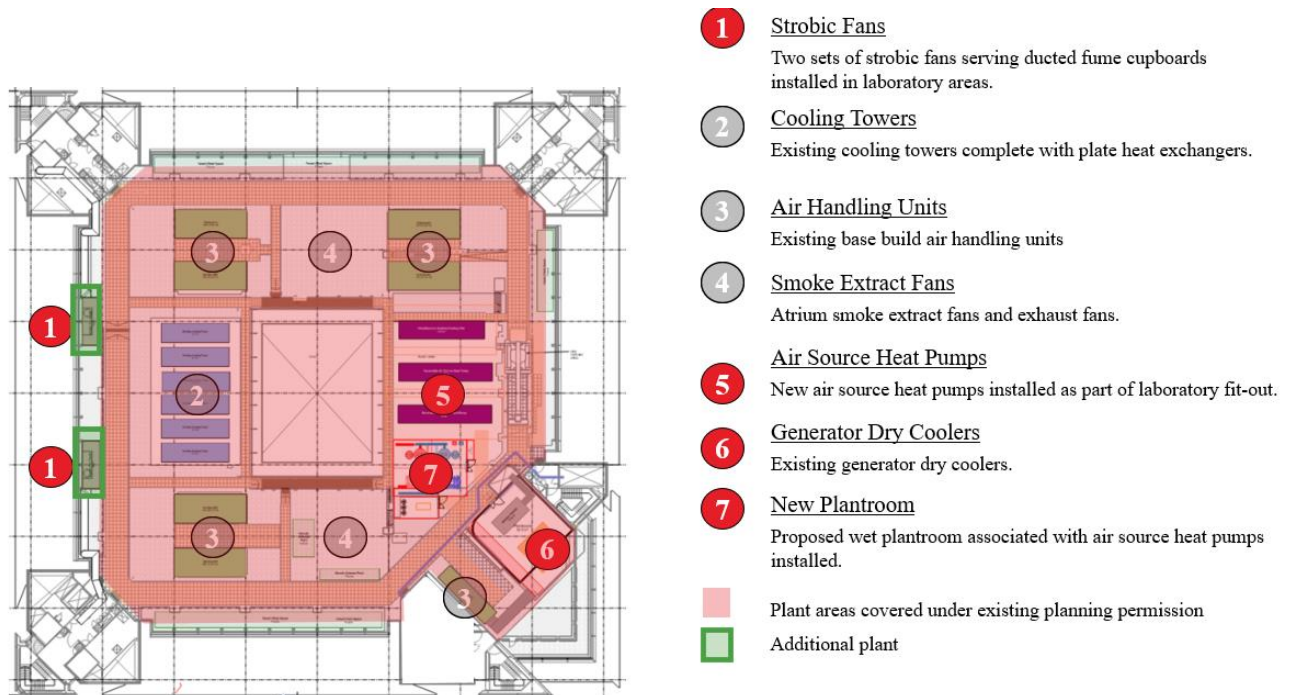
new plant areas on roof with original areas included in basebuild planning permission
